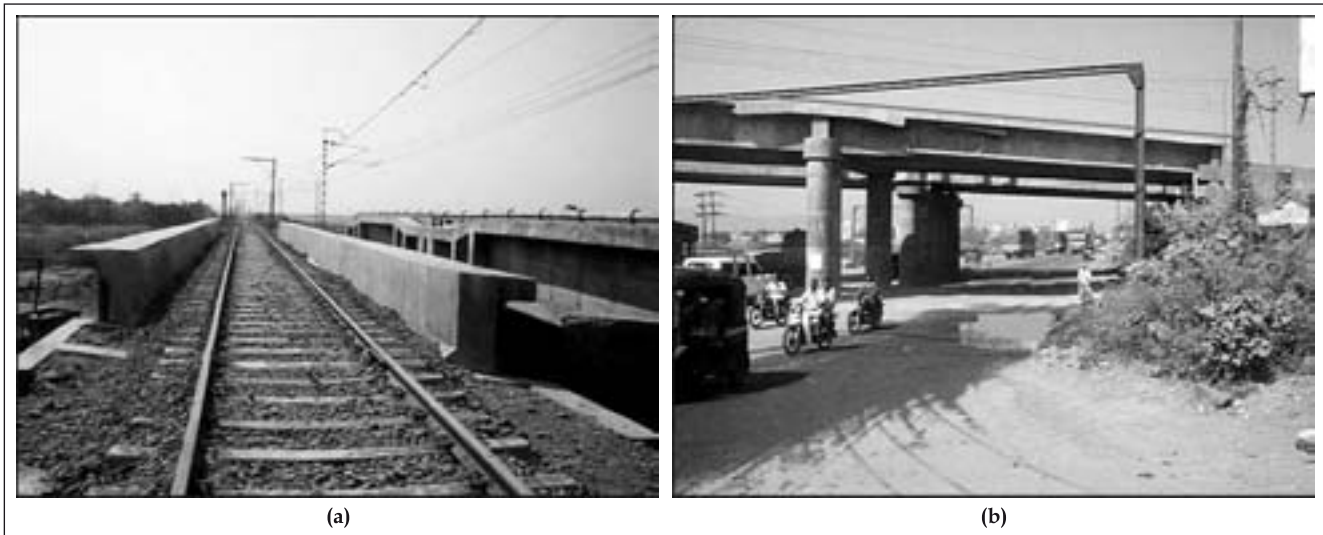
(a) Continuous U girder in prestressed concrete, 2003 (left). Simply supported U girder, 2001 (right). (b) Continuous U girder with monolithic pier in the foreground and simply supported U girder with wall piers in the background.
